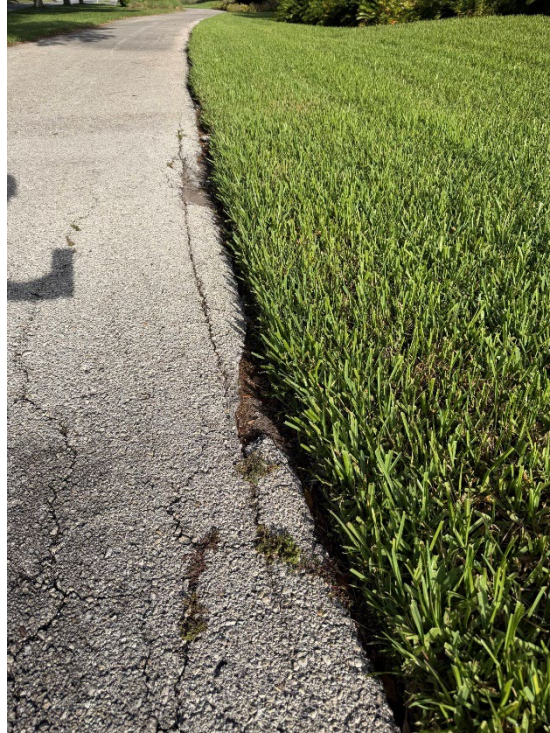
Cracked Concrete on Sidewalk
